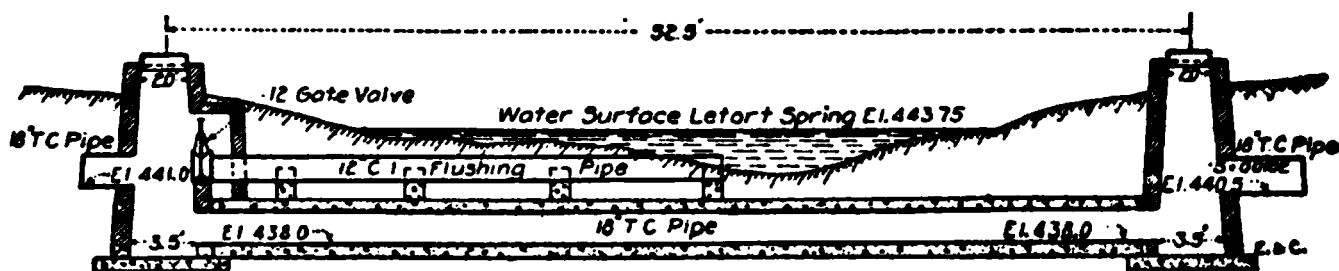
Longitudinal cross section of 18-in. clay pipe inverted sewer siphon under Letort Spring, Carlisle, Pa.
